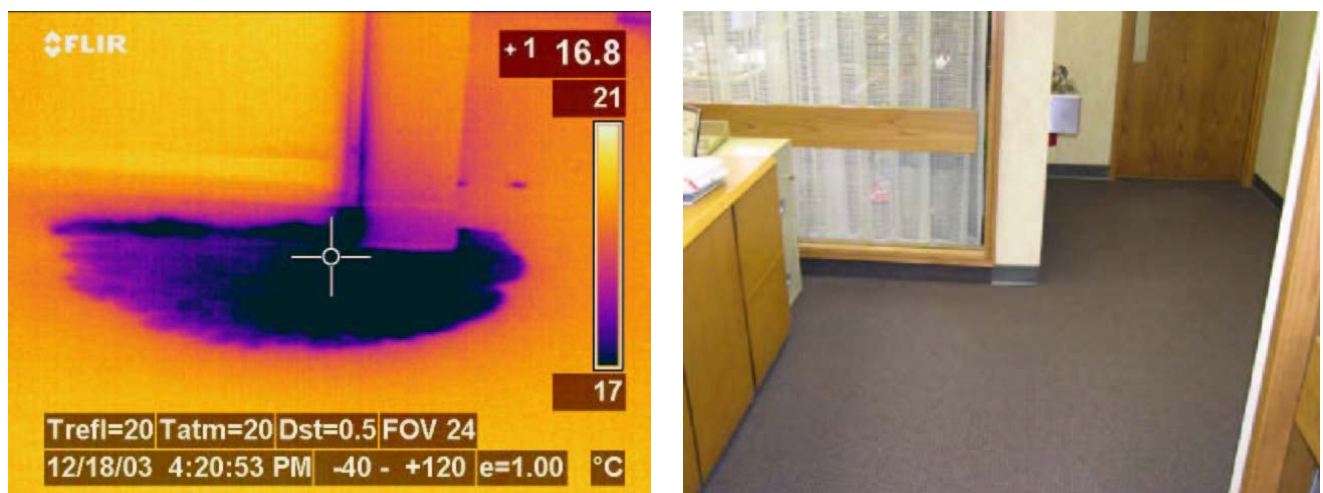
Thermogram/photo showing water intrusion from plumbing leak inside wall behind fountain
